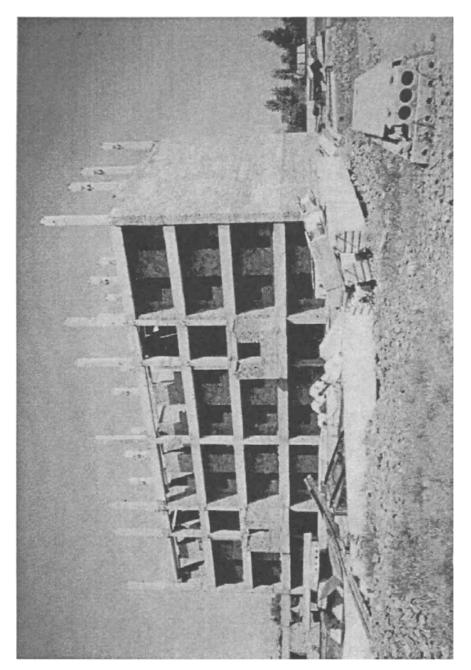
Typical reinforced concrete frame building construction in Central Asia.
